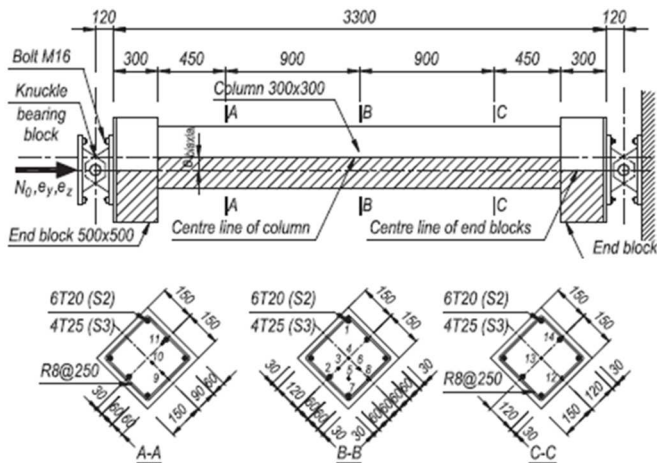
Details of typical test specimen (Tan & Nguyen, 2013)
